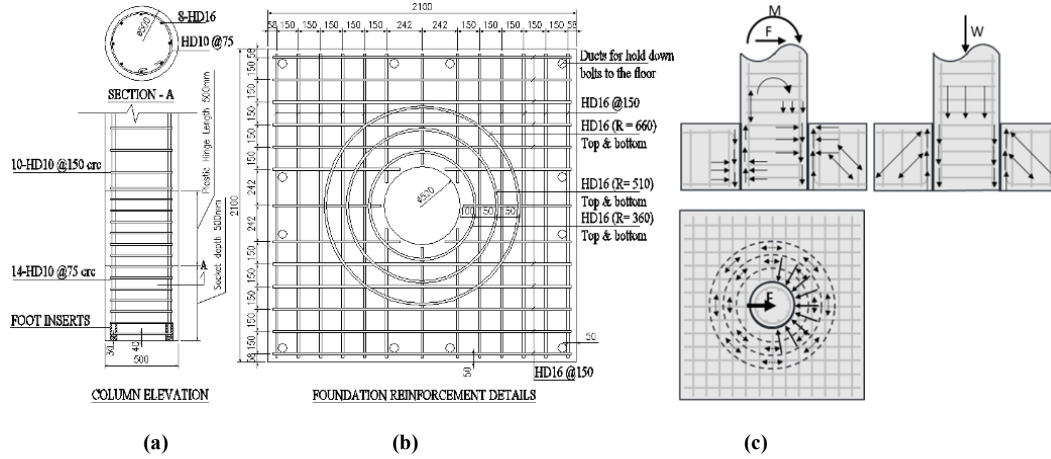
(a) Column section (b) footing reinforcement (c) internal actions under: (1) lateral loading (2) vertical loading (3) plan view showing radial compressive and tensile hoops stresses under lateral loading
